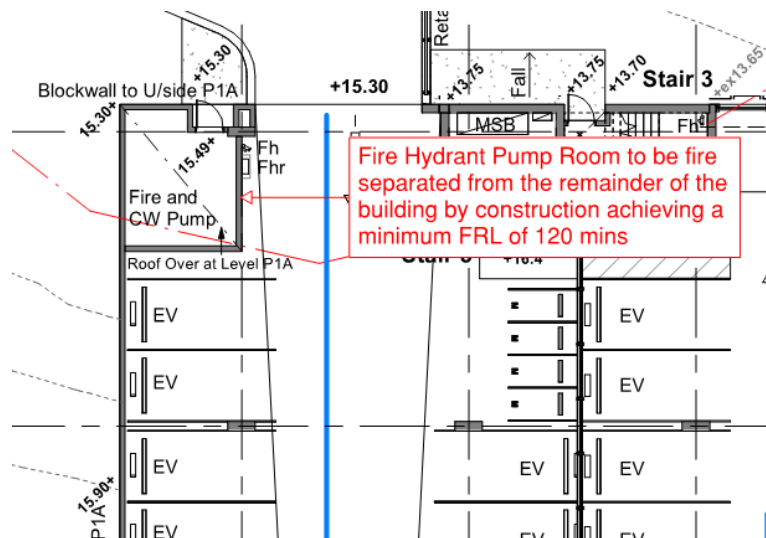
Internal fire hydrant pump room located on Level P1
